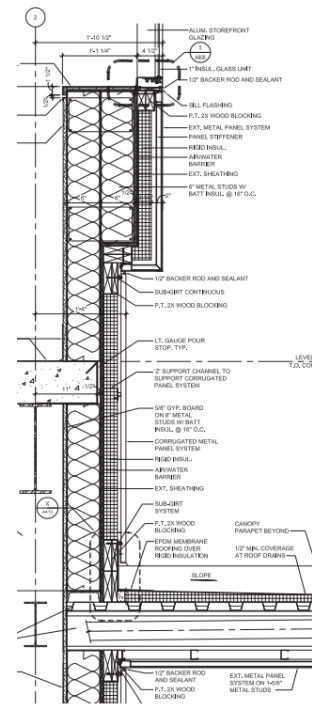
Typ. Architectural Wall Section (Source: TC Architects Construction Documents)
